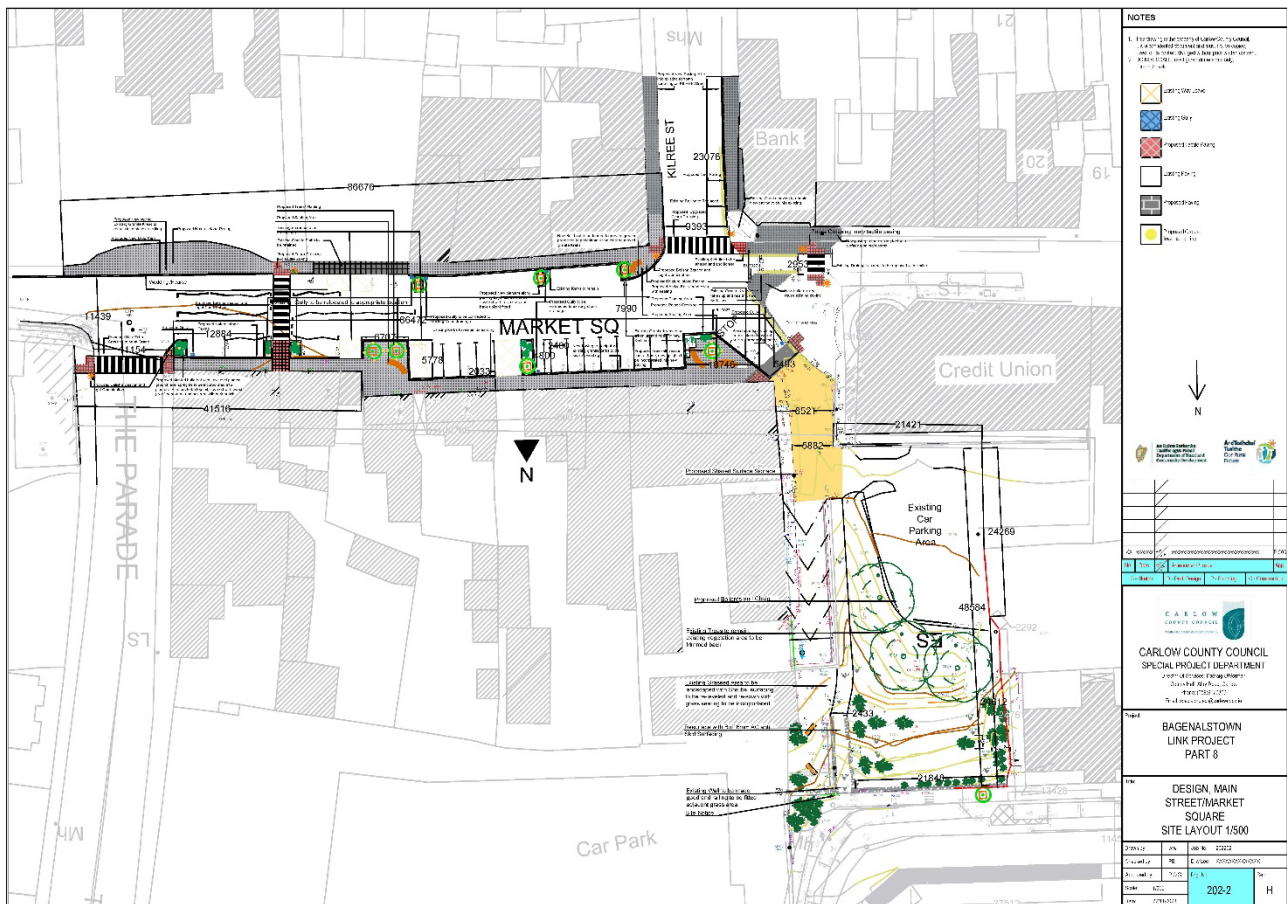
Refer to Sheet 202-2 H for a detailed drawing of the proposed scheme.
